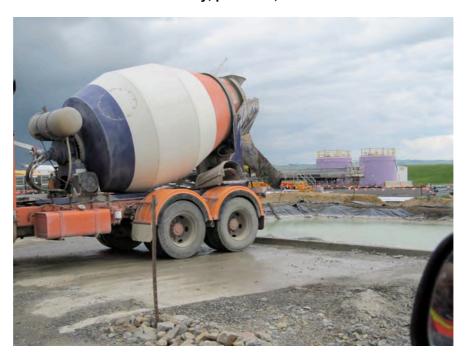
Concrete truck wash facility, plant site, Dec 2010.
